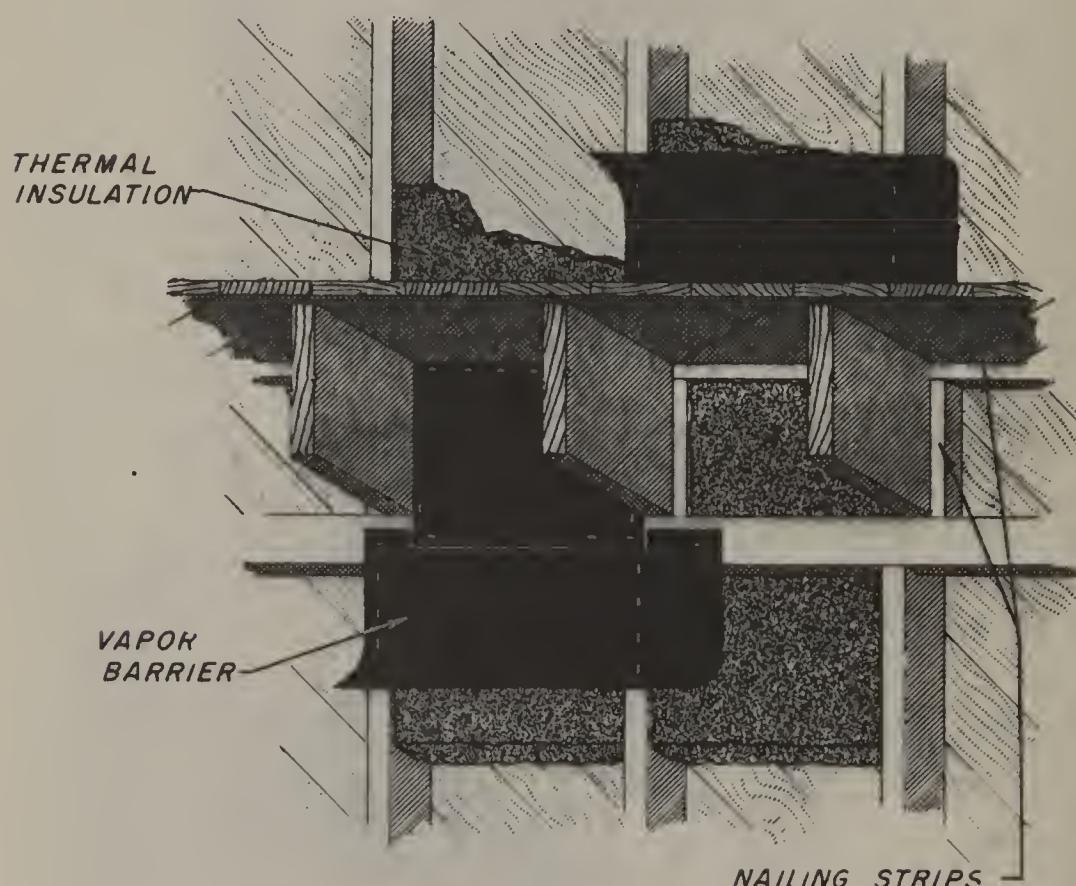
Junction of second floor and wall, balloon construction.
